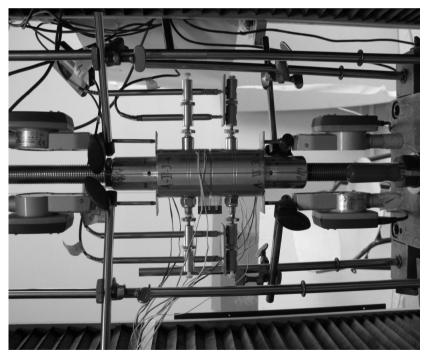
Photograph of test set-up (rotated 90 degrees, specimen hinged in test bench)
